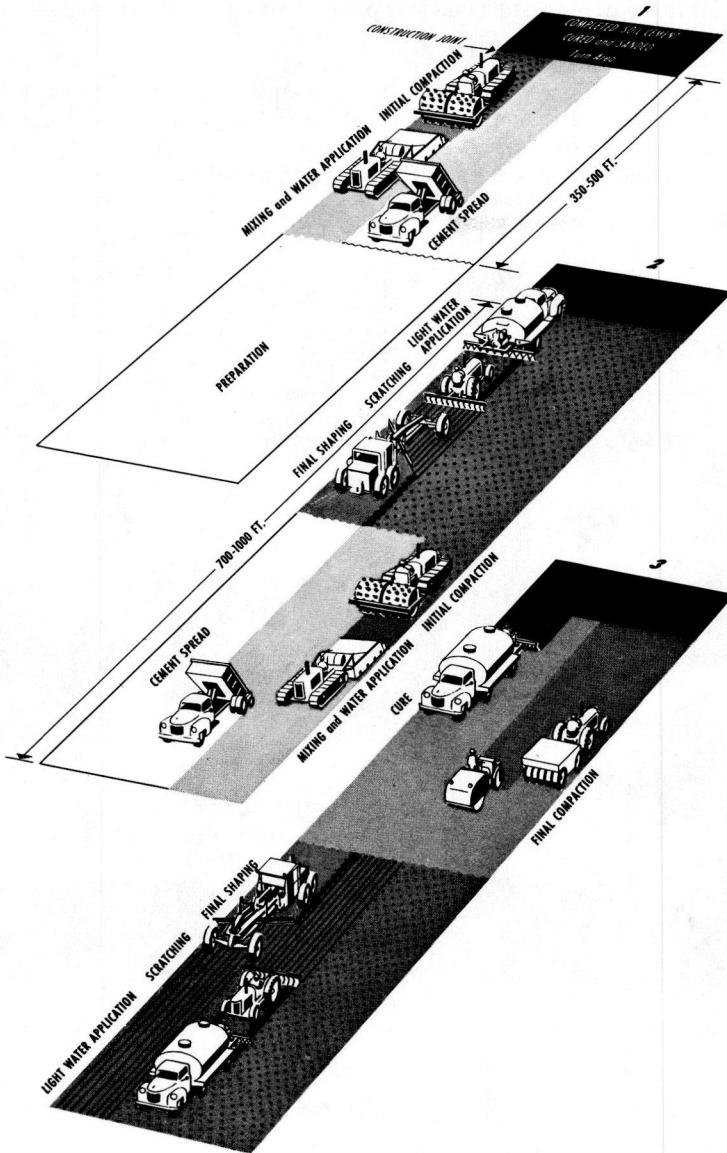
A. Diagrammatic sketch of soil-cement processing operations with a flat-type traveling mixing machine.
